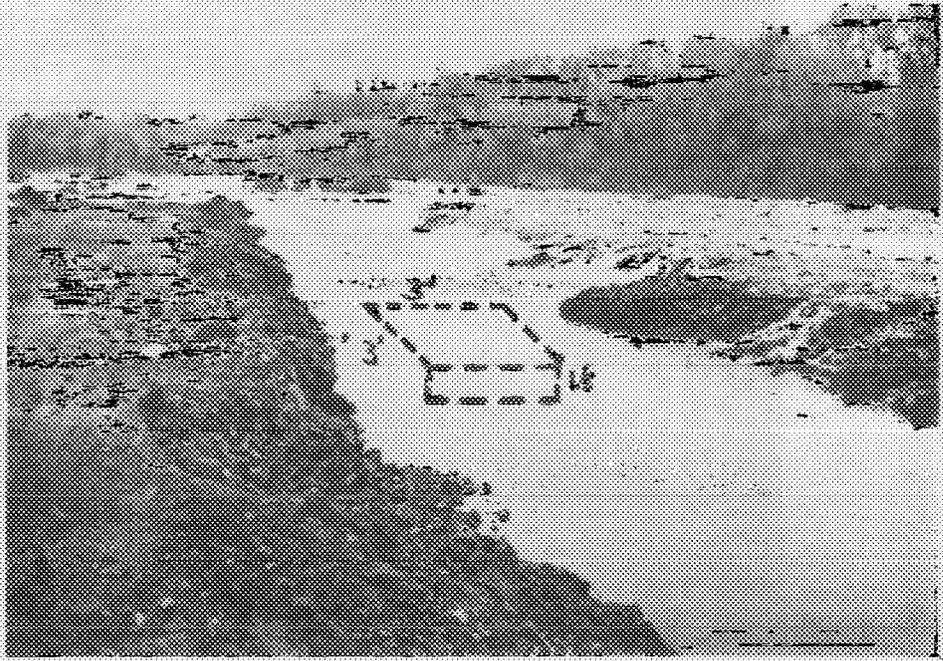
EXCAVATE 3'x3'x1.5' ROCK
